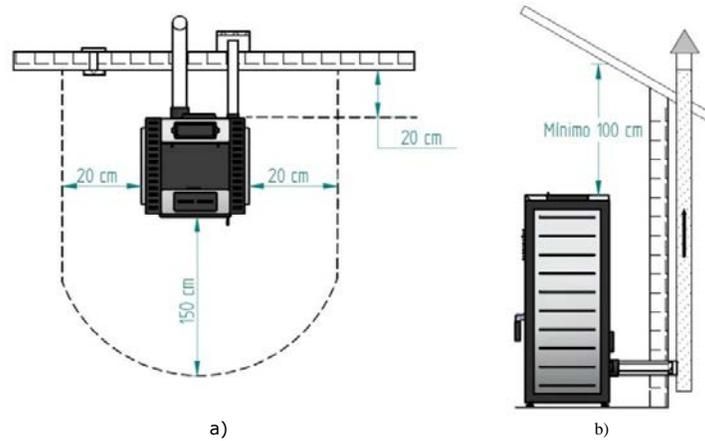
Minimum distances from all surfaces: a) upper view of the unit's installation; b) side view of the unit's installation
